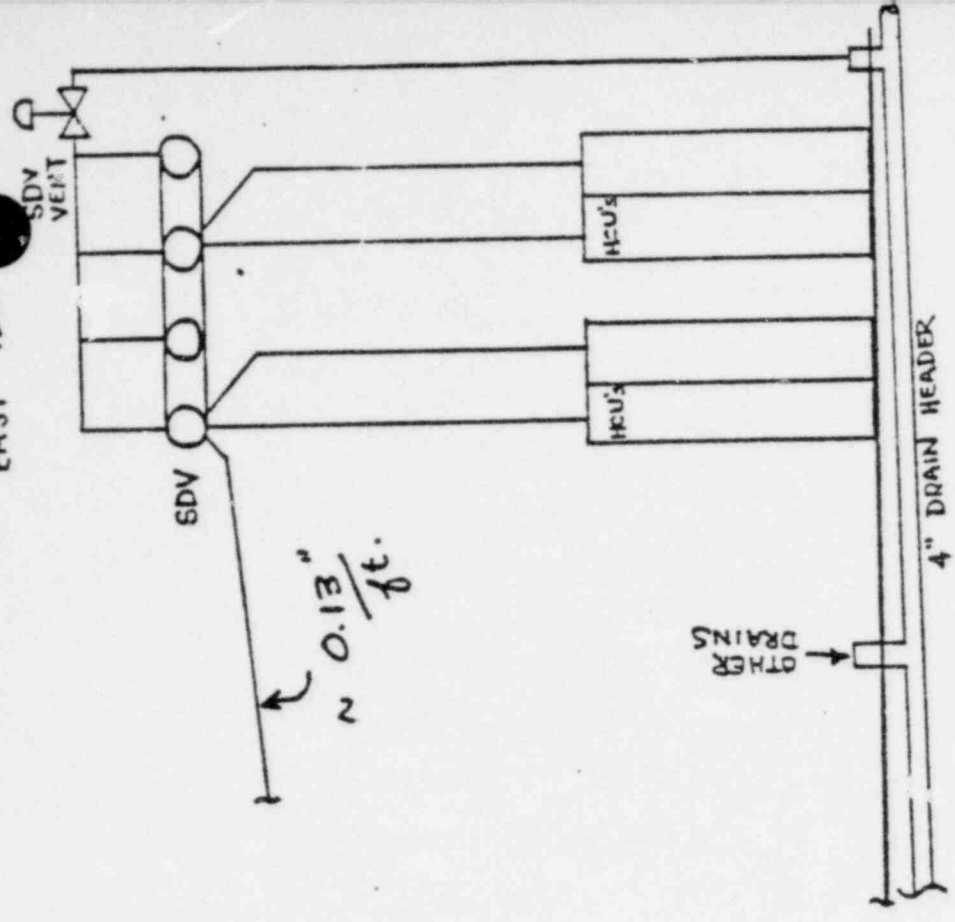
SKETCH OF BROWNS FERRY SDV EQUIPMENT LAYOUT (ELEVATION)
